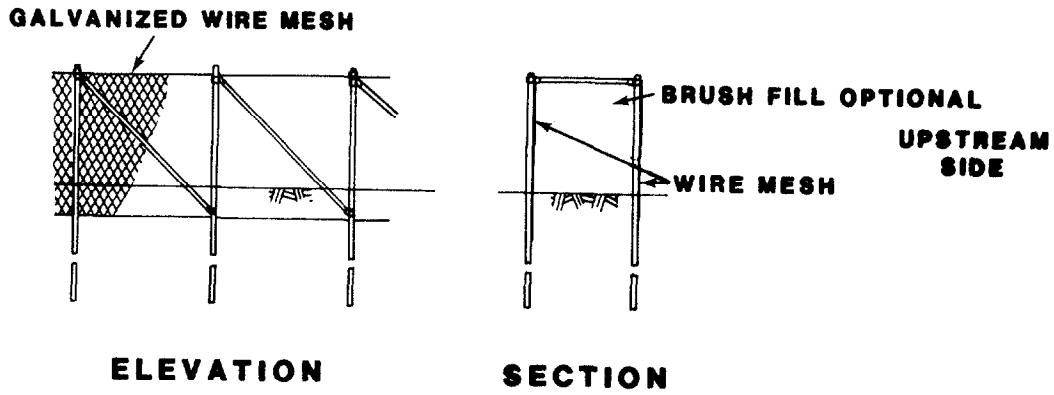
DETAILS OF LIGHT-FENCE-TYPE SPUR.
